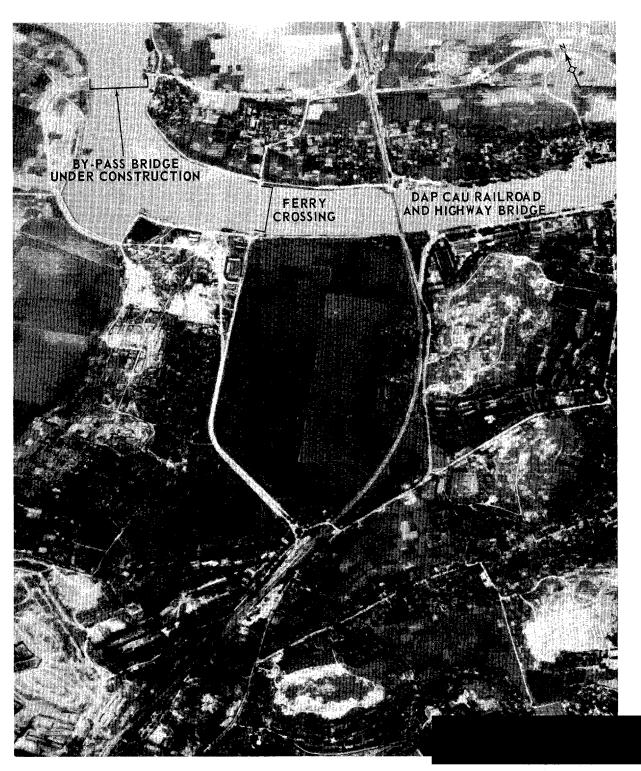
RAILROAD BY-PASS BRIDGE UNDER CONSTRUCTION, HA NOI/PING-HSIANG RAIL LINE, NORTH VIETNAM
